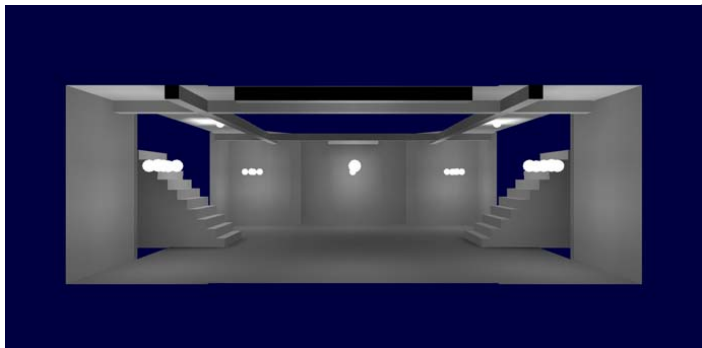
Lighting Calculation: First Floor Rotunda
